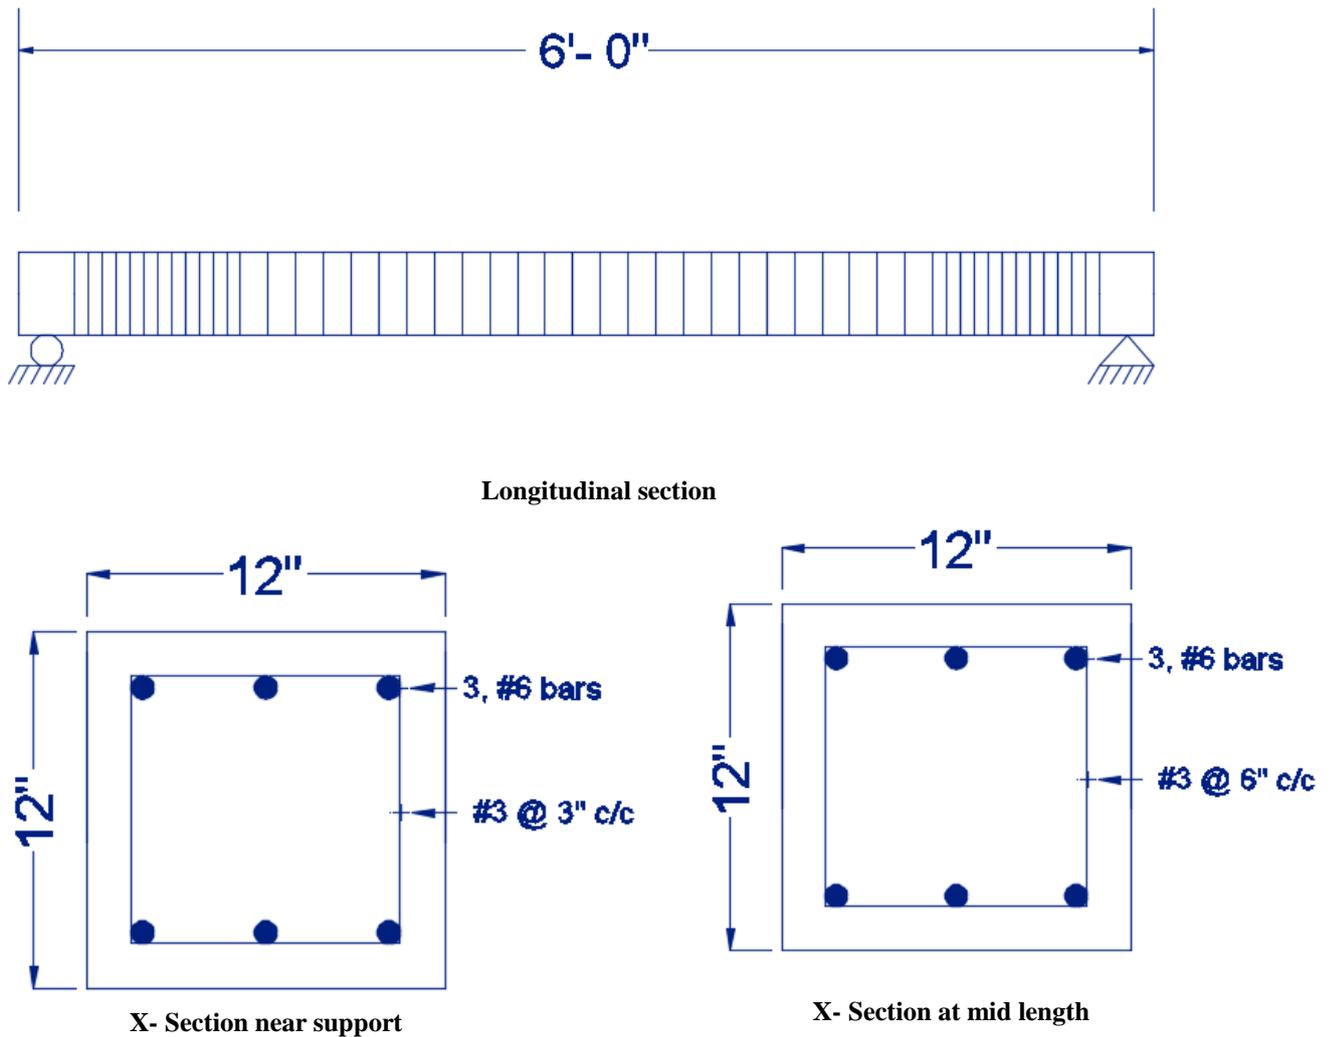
Full scaled reinforce concrete beam and reinforcement details
